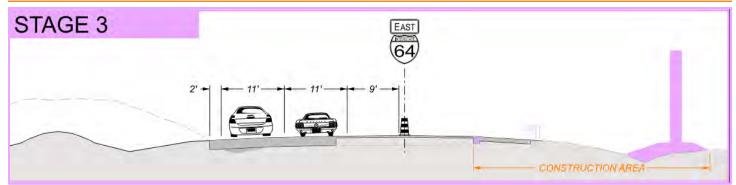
TMP Typical Sections, Stage 3
